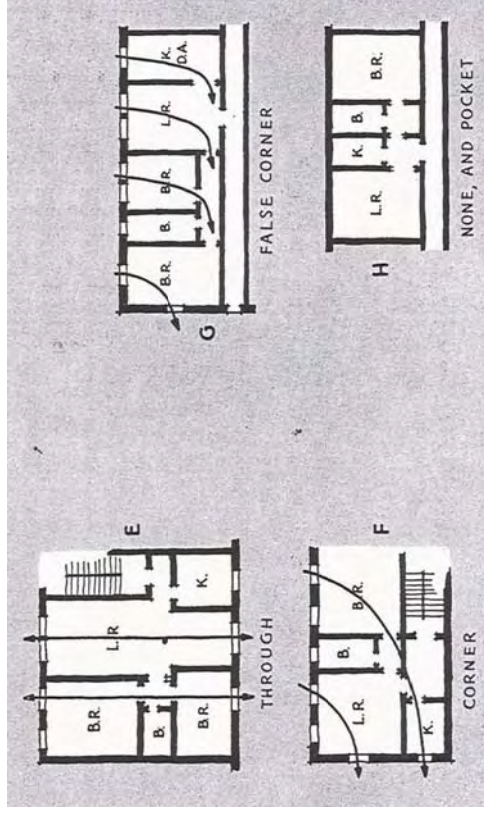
From the FHA, unit floorplans showing natural ventilation.
